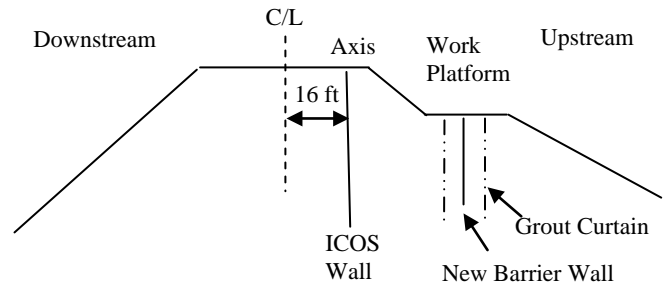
Typical Cross-Section of modified Dam and Key Features (NTS)
